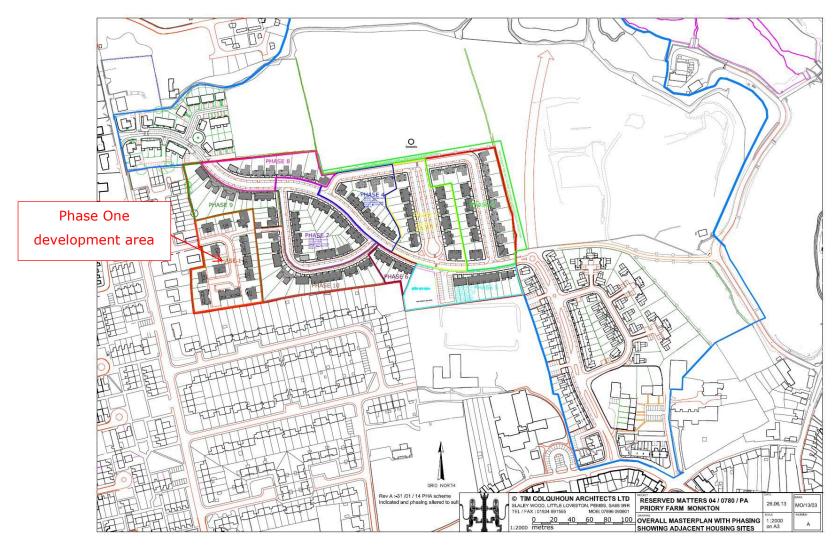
Plan showing the whole area proposed for development. Plan supplied by client.
